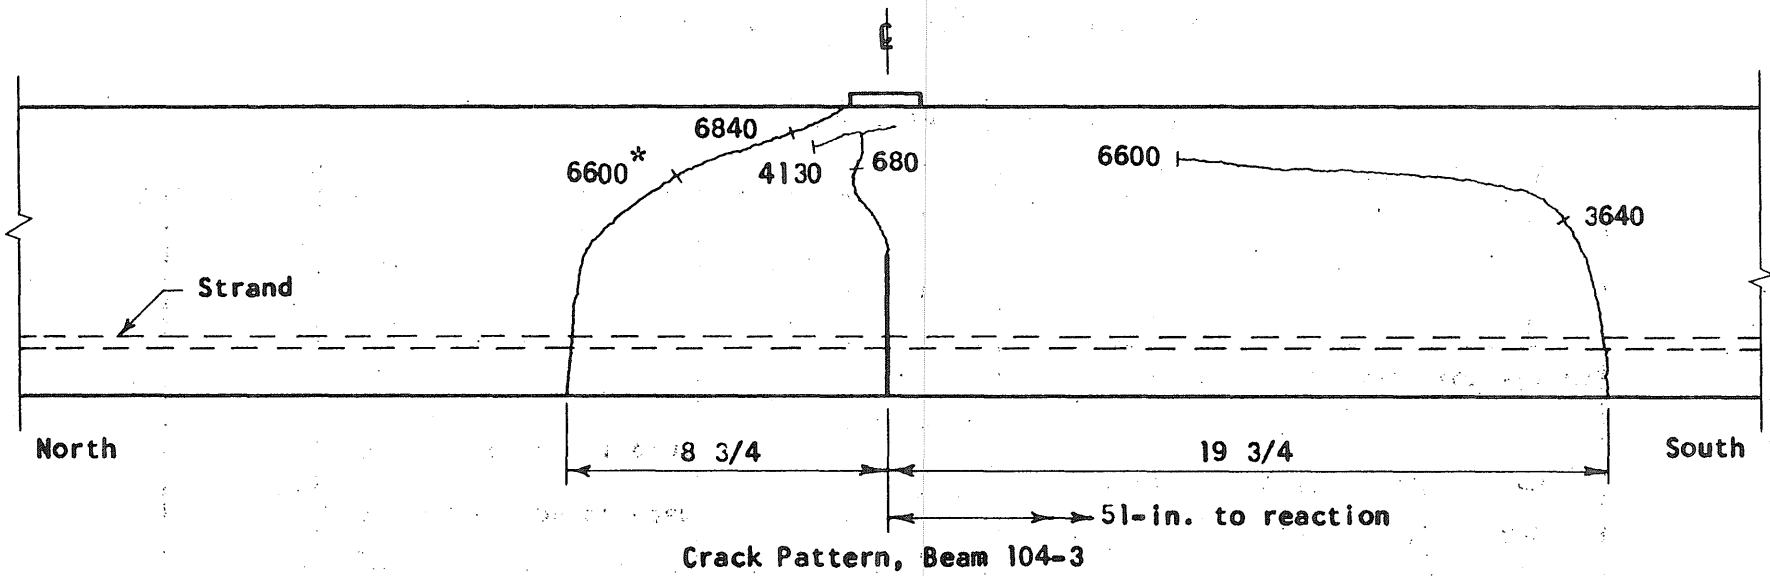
BEAM CRACK PATTERNS
